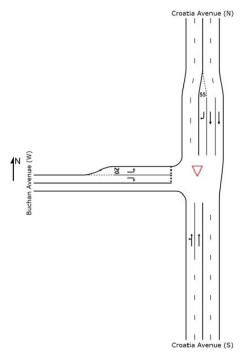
2036 Croatia Avenue/ Buchan Avenue Layout
